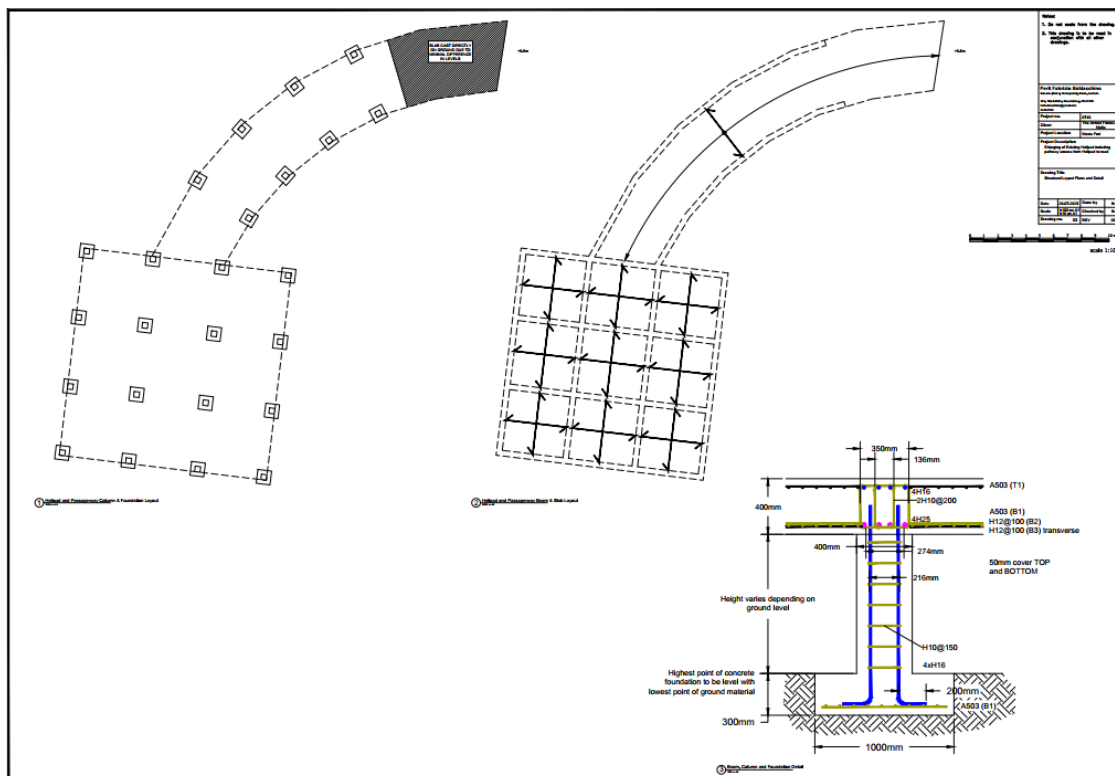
Structural plan, showing foundation of stilts to support concrete slabs (*Source: PDS*)
